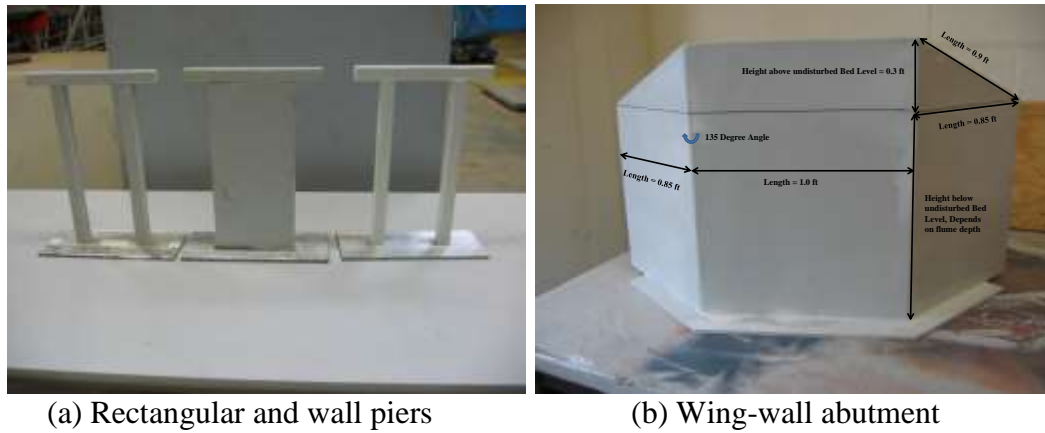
Fabricated models for rectangular pier, wall pier, and wing-wall abutment
